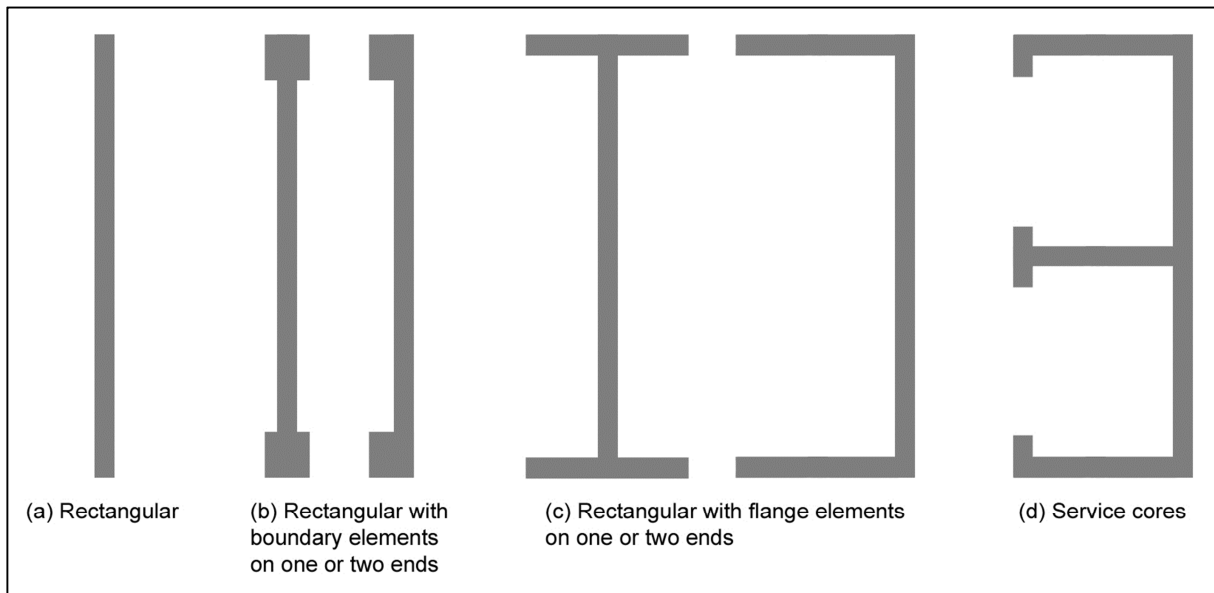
Wall sectional shapes (Dazio & Beyer, 2009, p.7-8)
